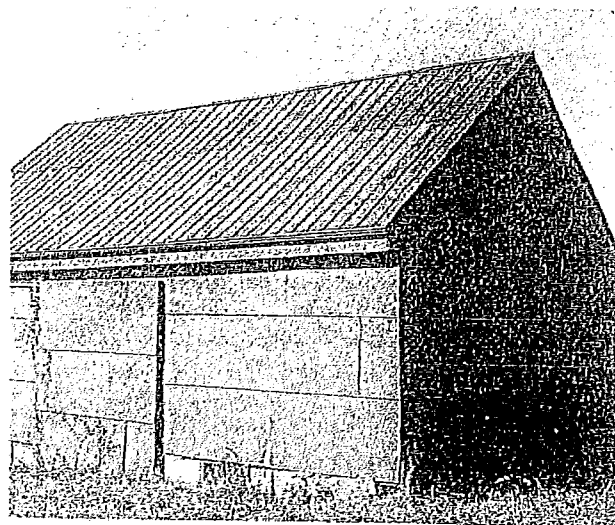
Severely deteriorated wooden siding on a farm building has been covered over with painted plywood panels as a temporary measure to eliminate moisture penetration to the interior. Foundation vents and loose floor boards allow air to circulate inside.
